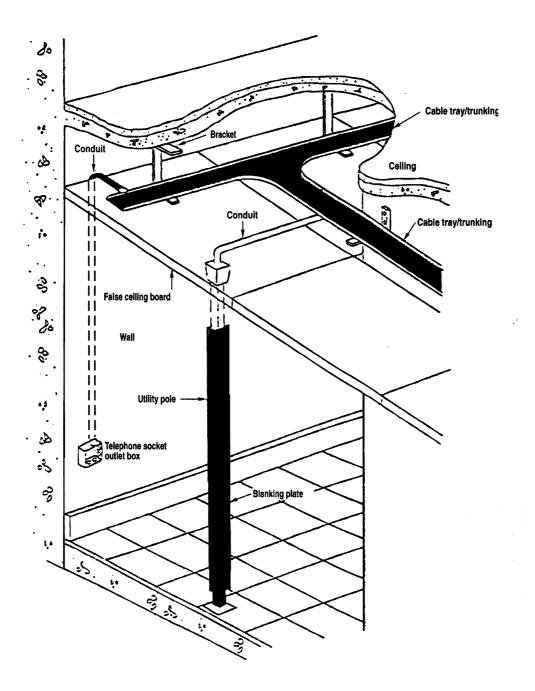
CEILING DISTRIBUTION SYSTEM - TYPICAL DETAIL OF CABLE TRAY/TRUNKING LINK WITH CONDUIT IN UNDETACHABLE FALSE CEILING BOARDS/ STRIPS THAT ARE NOT EASILY REMOVABLE
